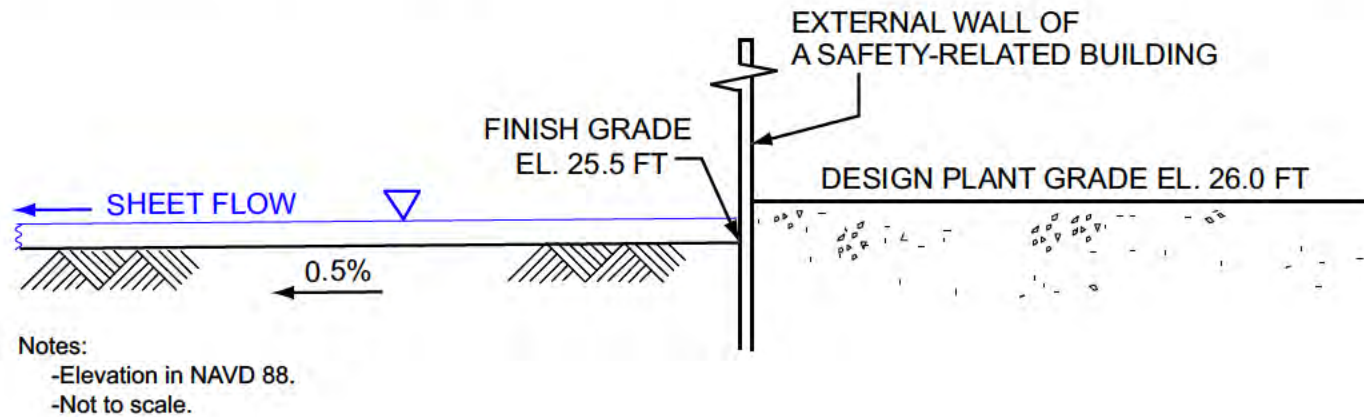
Schematic of Overflow Condition at the Retaining Wall Boundary
